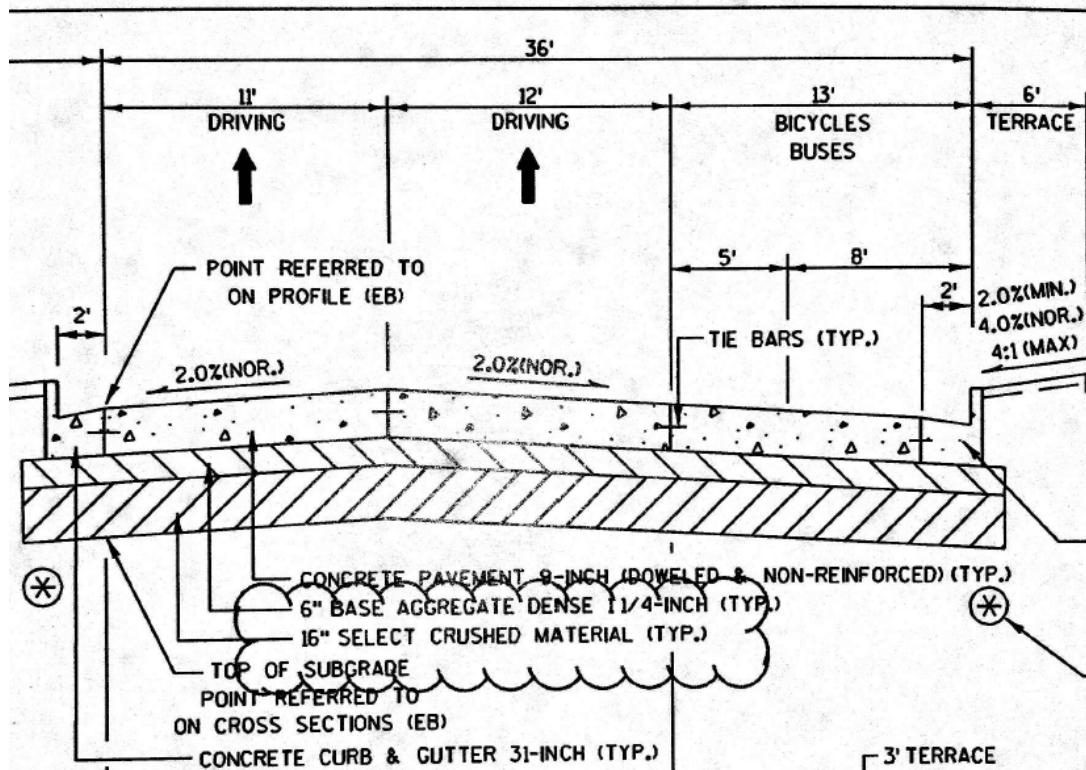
Cross Section of Pavement Structure at Greenfield Avenue. The contractor was unable to push the rigid pipe through the 40.6 cm (16 in.) crushed rock layer until a small backhoe excavated application points along the trench.
